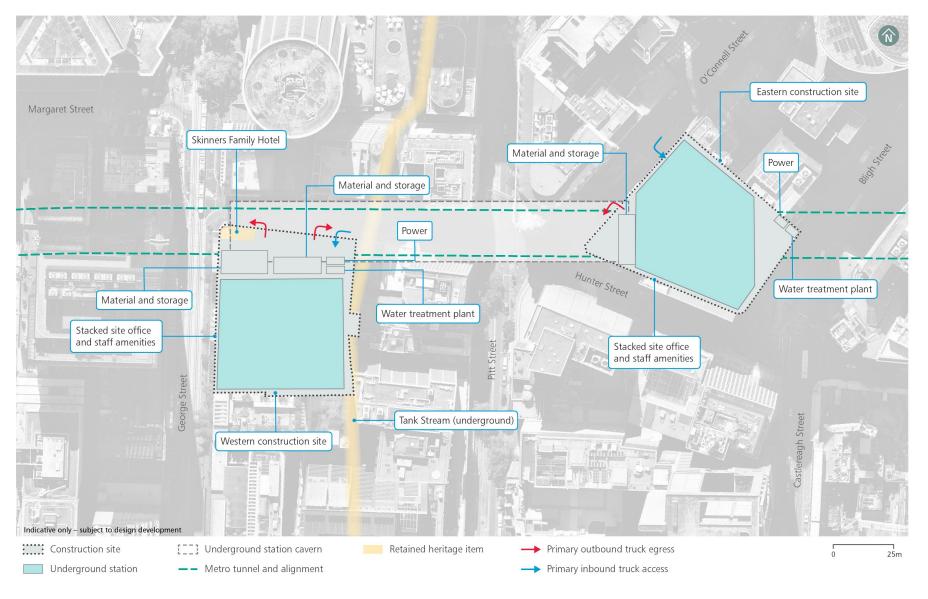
Hunter Street Station (Sydney CBD) indicative site layout (construction)
